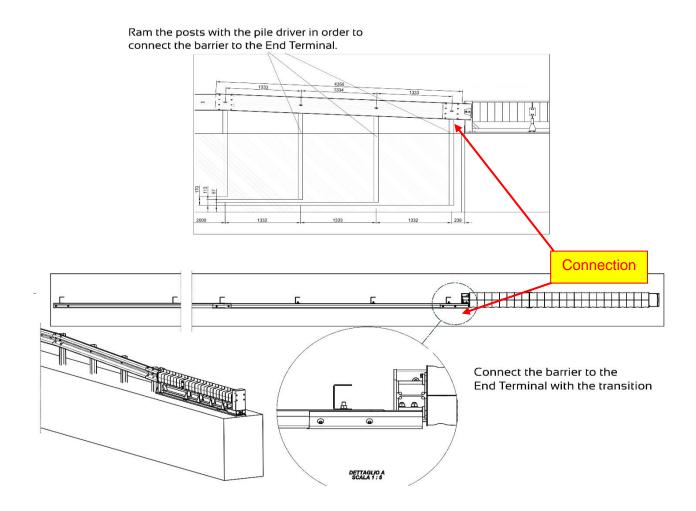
End Terminal SMA T2 connected to a slope down N2W2 barrier.
